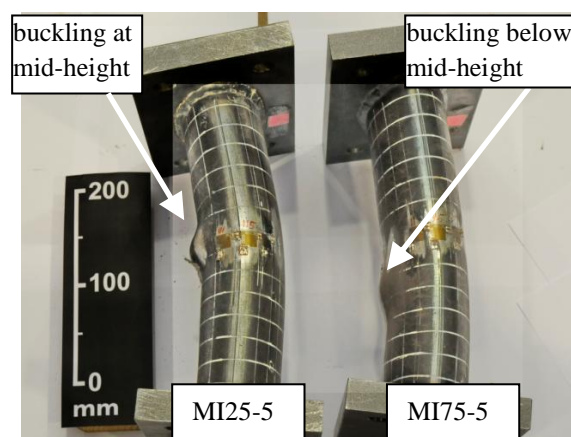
Failure modes for test specimens MI25-5 and MI75-5.
